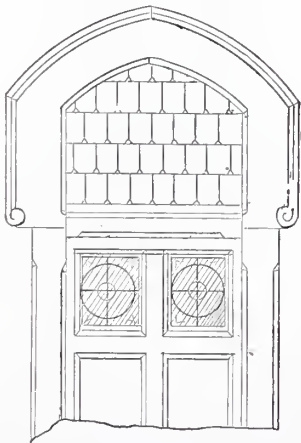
Part Elevation of Principal Windows.—Scale, $\frac{1}{2}$ Inch to the Foot.
